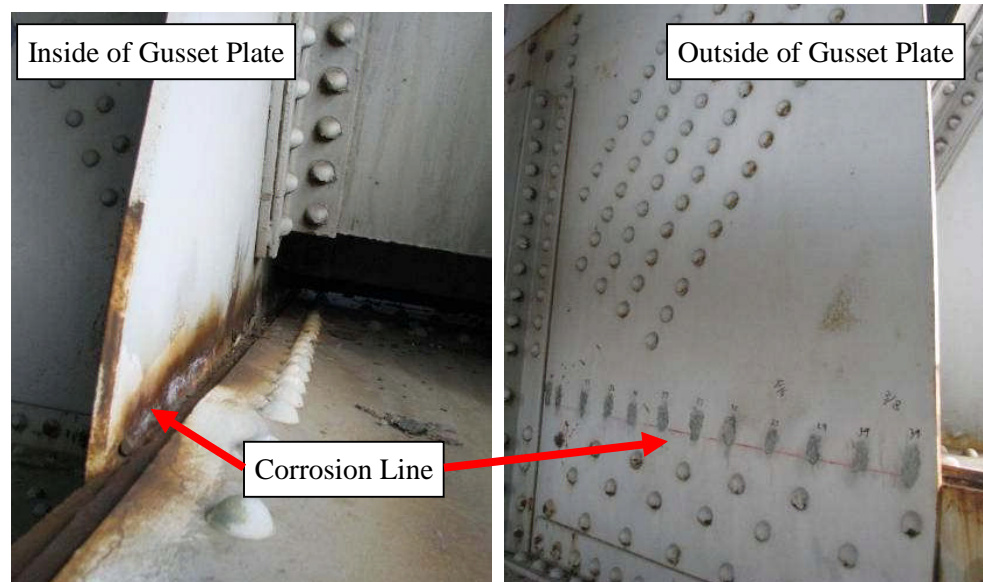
Corrosion Line Viewed from Inside and Outside of Gusset Plate
